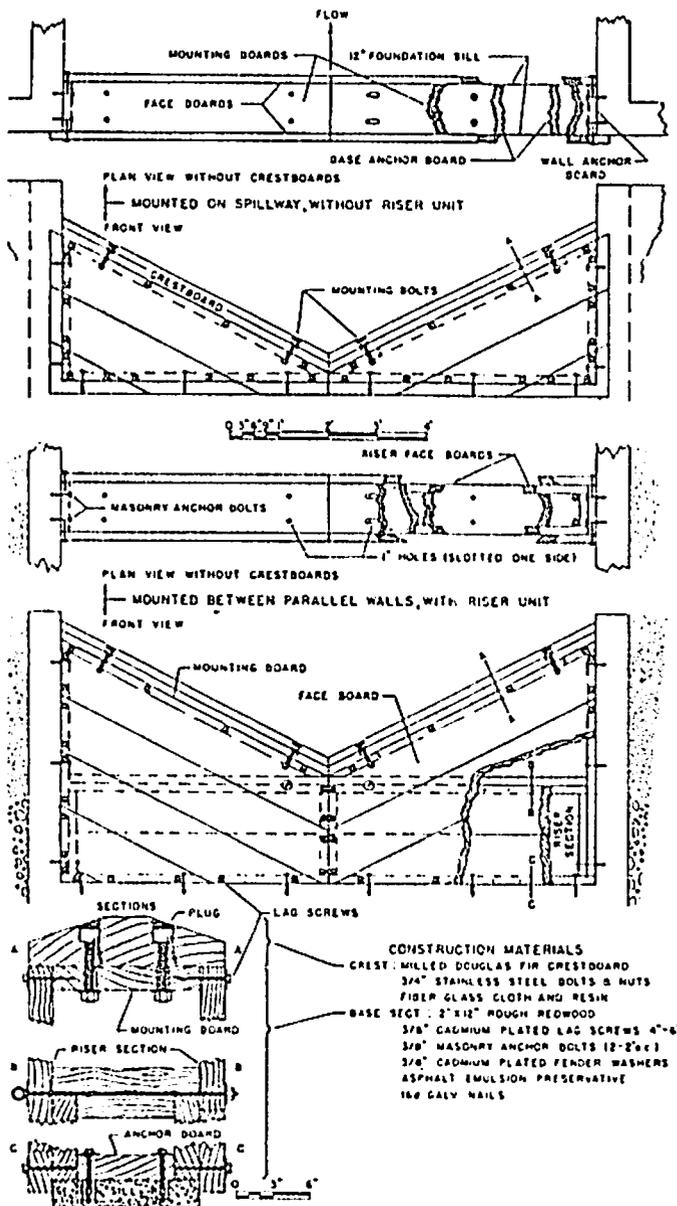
Generalized construction plans for fiberglass-coated wooden, 16-inch, broadercrested V-notch weirs.
